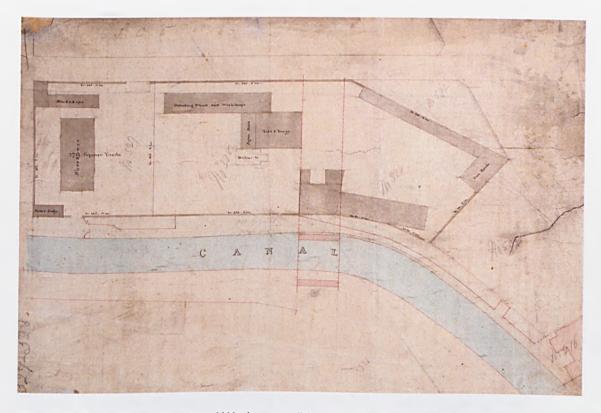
Early plan of the Sheaf Works, possibly a design drawing, with additions in red pen relating to the construction of a railway viaduct over the site. Scale c.1:1500 (SCA).
